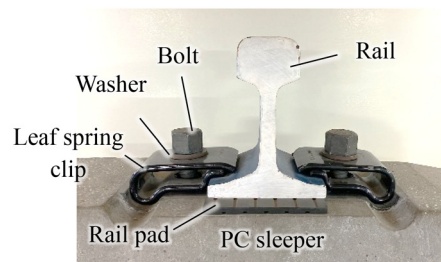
Rail fastening system using leaf spring clips and bolts (5N-type)
